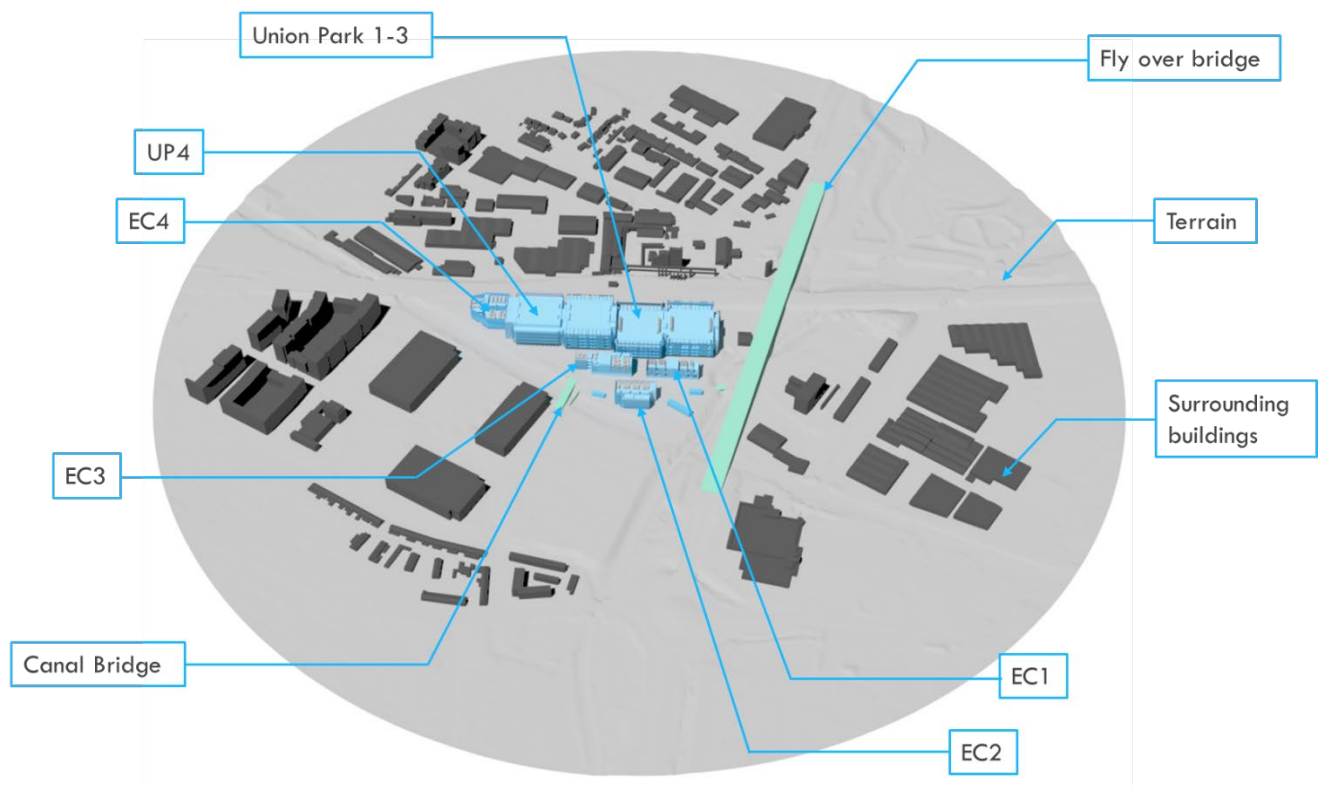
North perspective view of the modelled proposed Union site and surrounding buildings.
